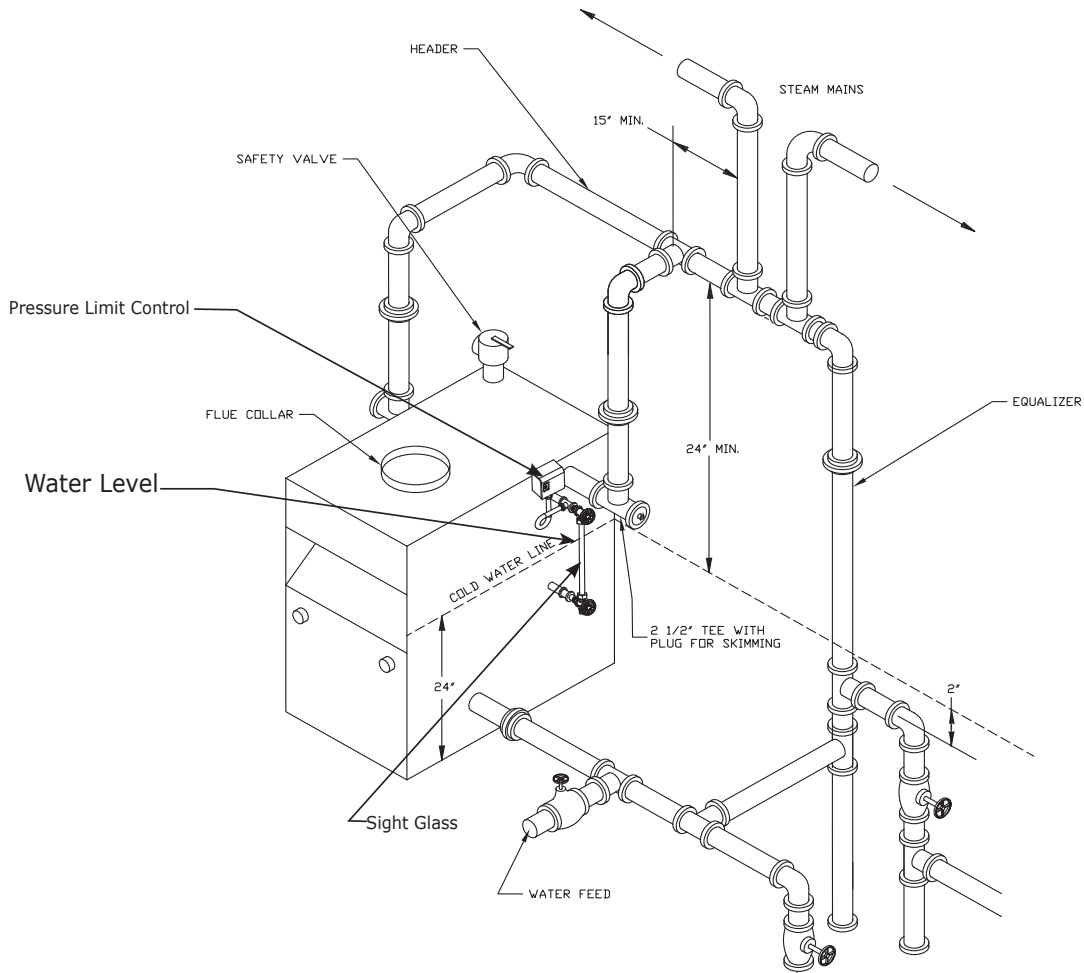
Steam Boiler – Optimum Water Level With Boiler OFF and COLD
